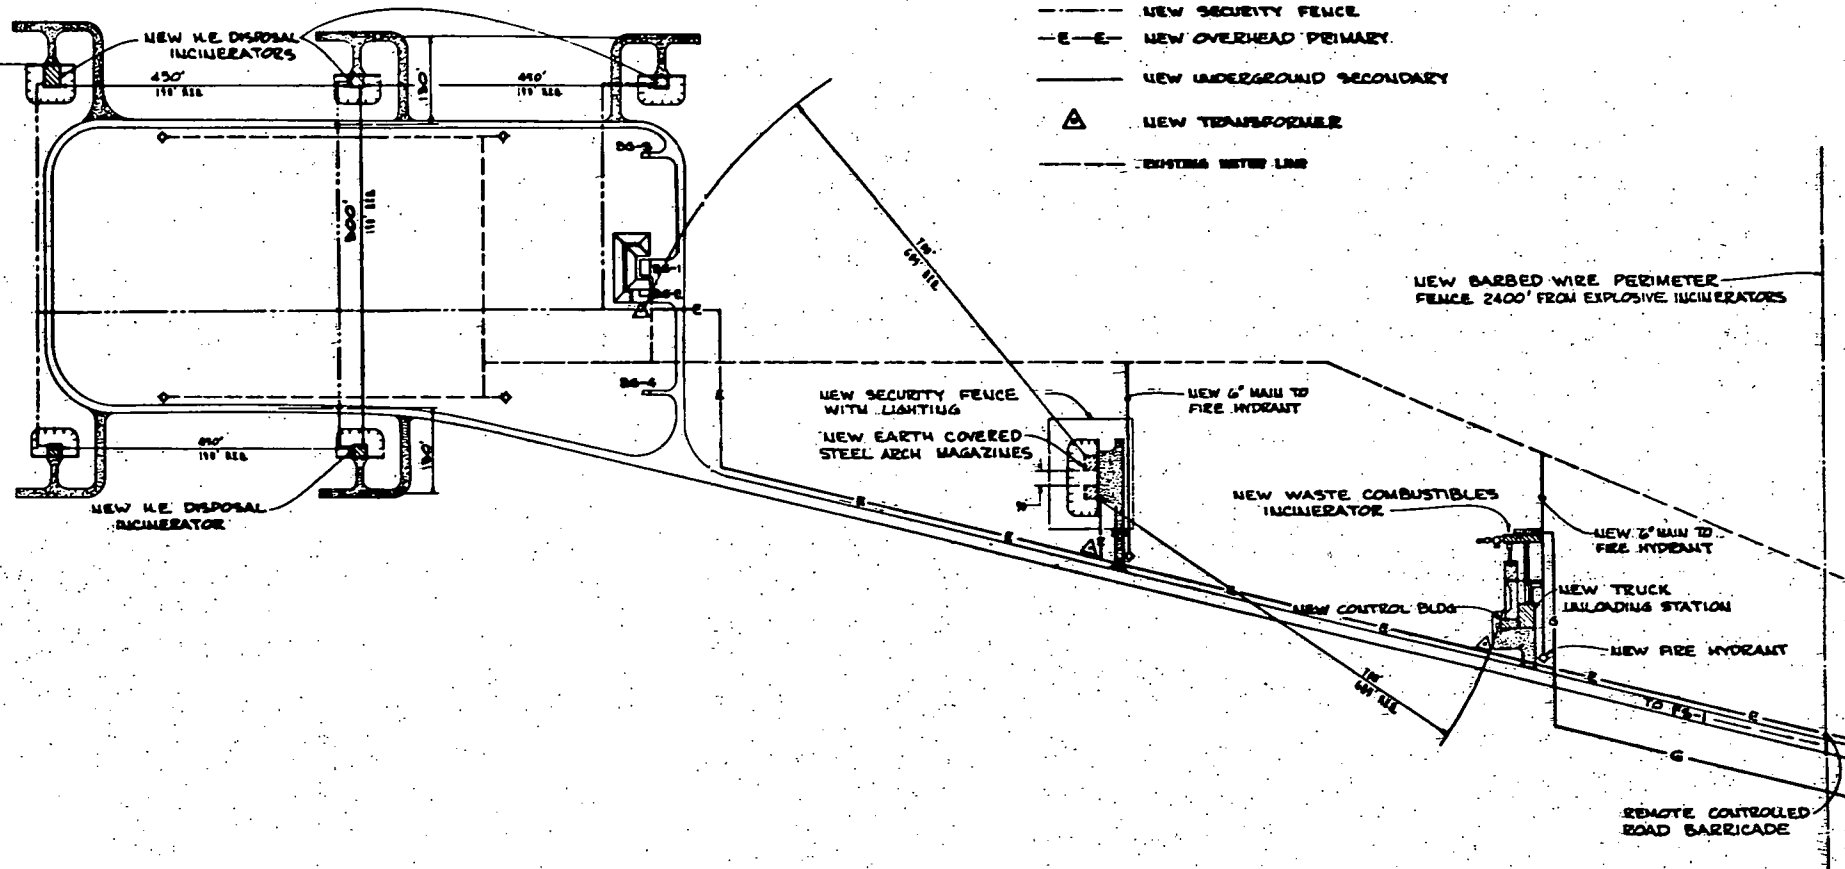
Proposed Waste Disposal Facilities Site Plan
